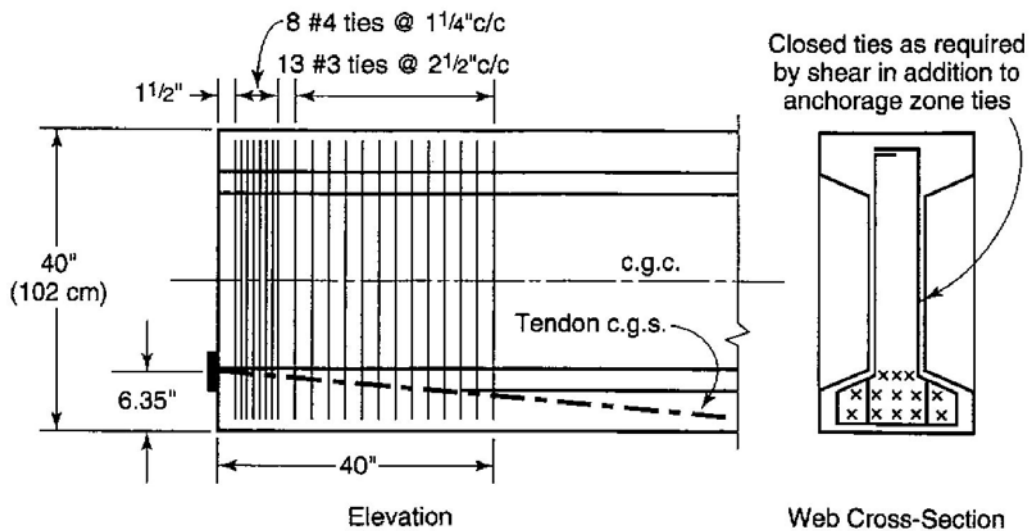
End anchorage reinforcement in Example 4.6. (a) Anchorage zone, (b) Beam cross section.
